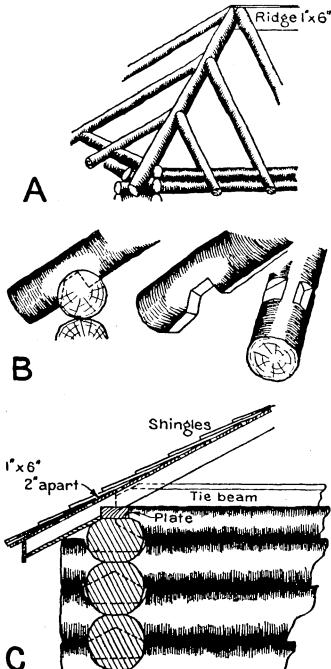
A, a ridge board facilitates making a straight roof line; note that the hip rafters are larger than the common rafters; B, with this type of joint it is difficult to keep the eaves level; C, a good method of terminating the wall even though poles are used for rafter
